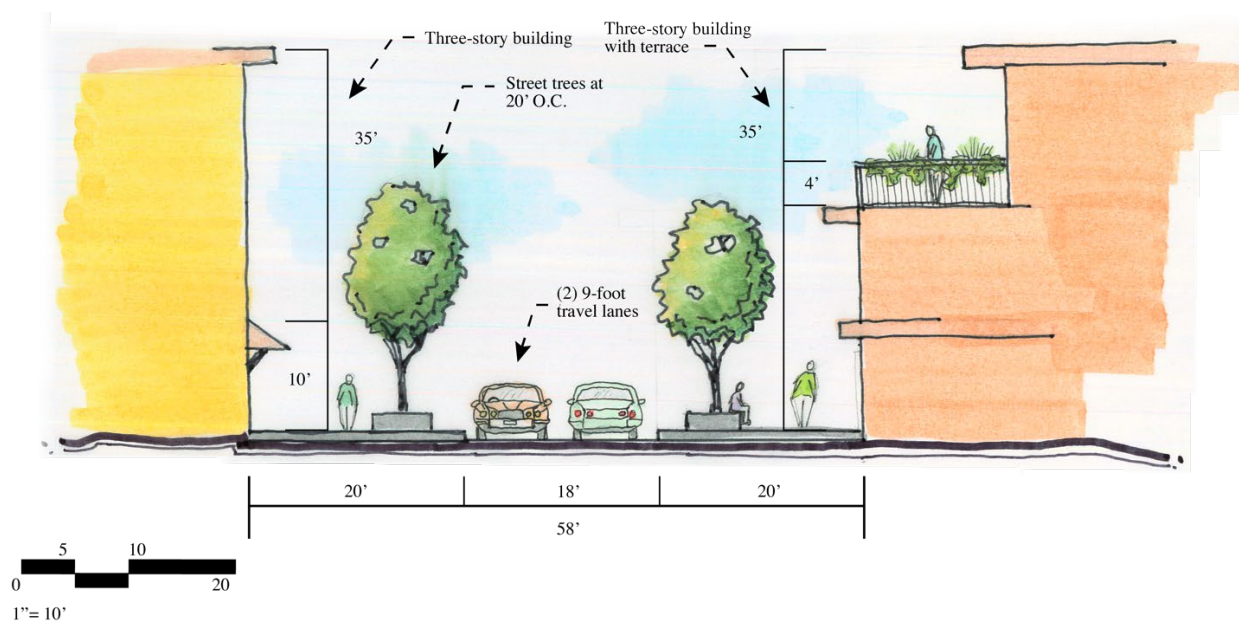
Section view of streetscape looking south on Bedford Avenue. Graphic by author.
